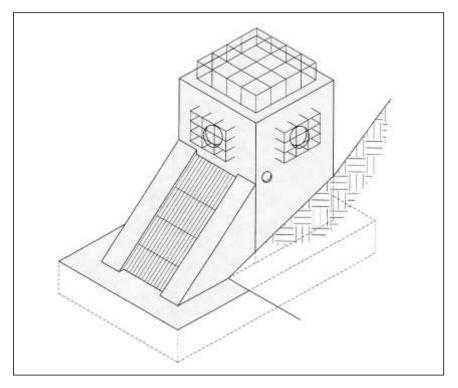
Example of Various Trash Racks Used on a Riser Outlet Structure (Source: VDCR, 1999)
